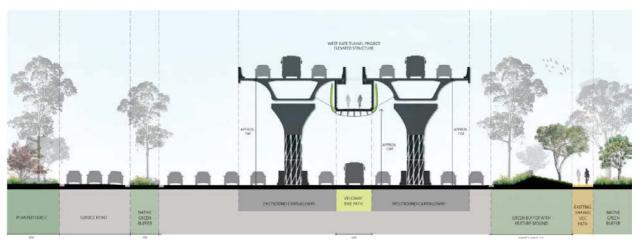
Cross section of the Footscray Road Elevated Structure Source: EES Map Book
